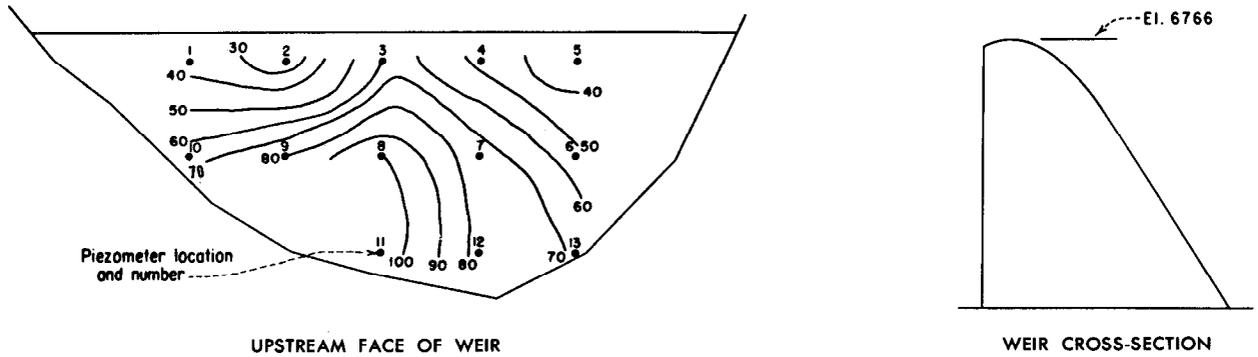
Maximum instantaneous impact pressures on the upstream face of the weir, following removal of the corbel and the piers. Reservoir elevation 7165 with spillway gates fully open. Spillway  $Q=40,000$  cubic feet per second.
